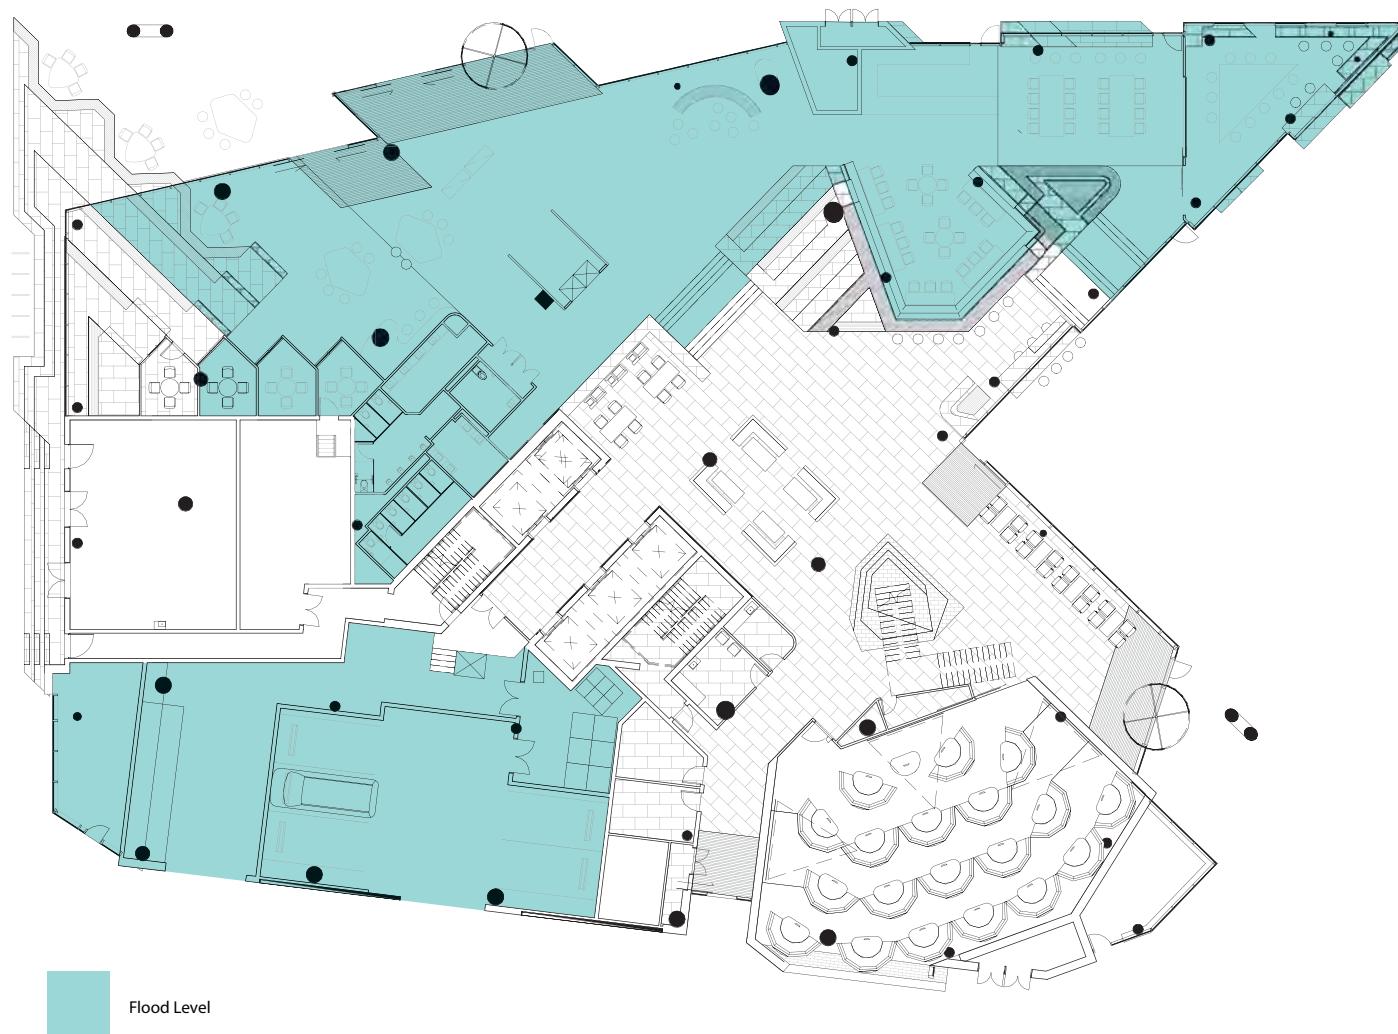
Area of Ground Floor Plan below the Floodplain
